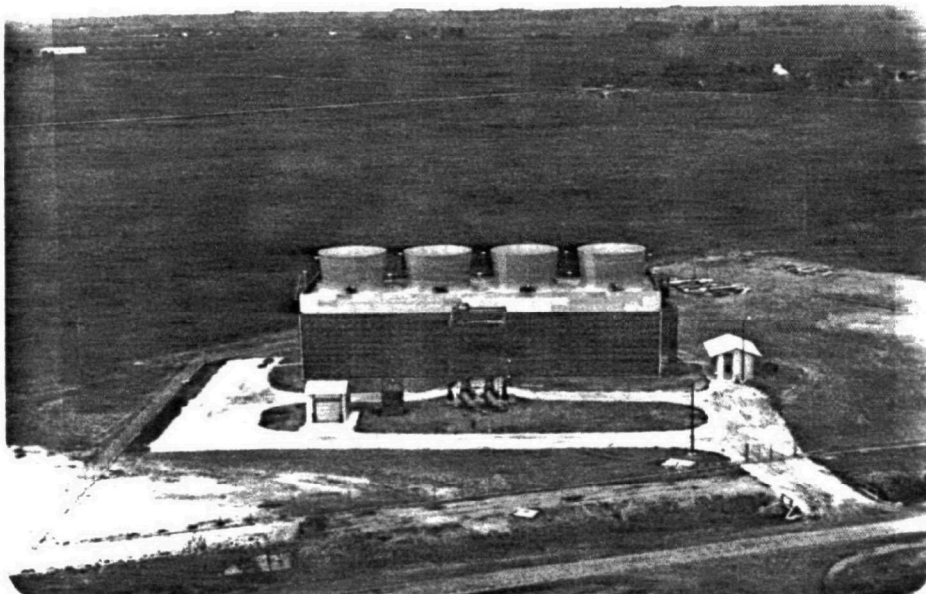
View from the boiler house roof facing north-east showing the cooling tower and the surrounding area.
